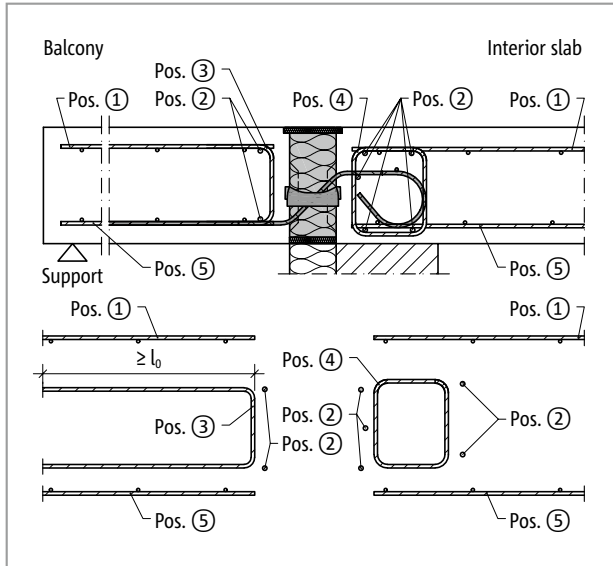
Schöck Isokorb® T Type CQ-V1 up to CQ-V5: On-site reinforcement
